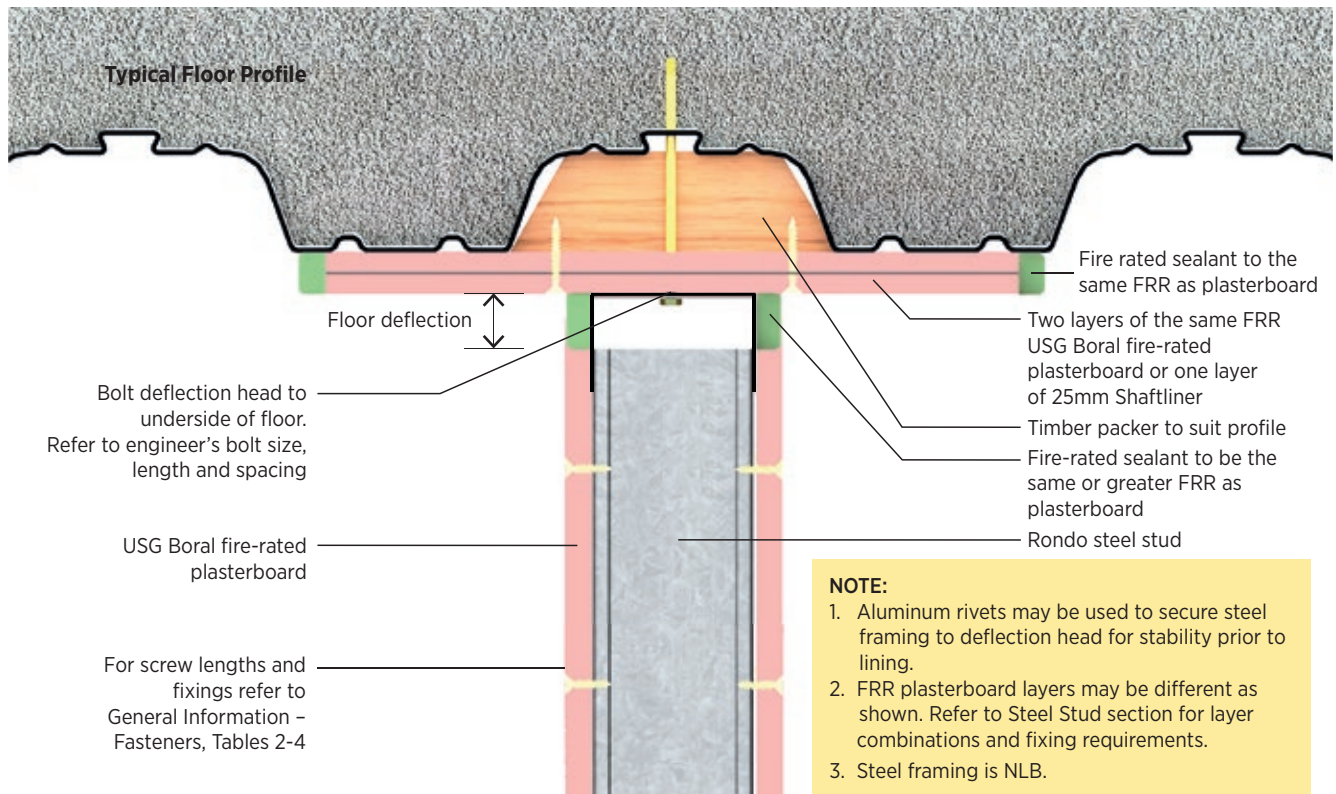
Steel Stud Wall Parallel to Rib Profile - Timber Blocking
